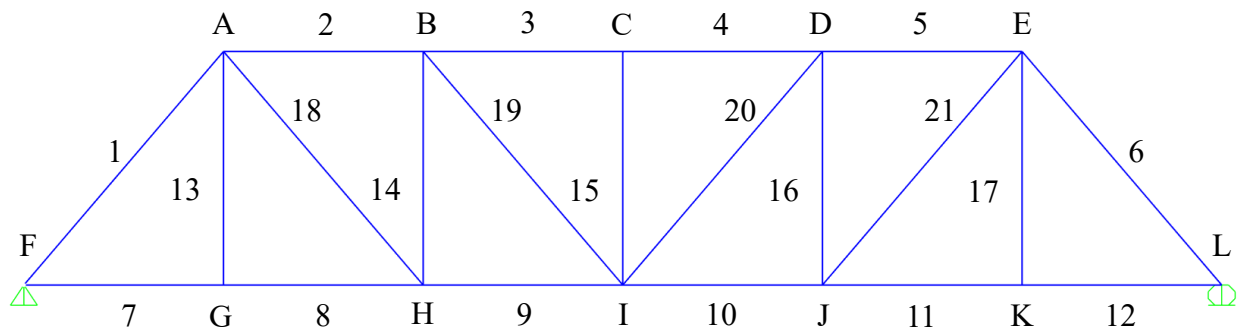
Steel truss bridge based off real-life structure in NB, Canada.
